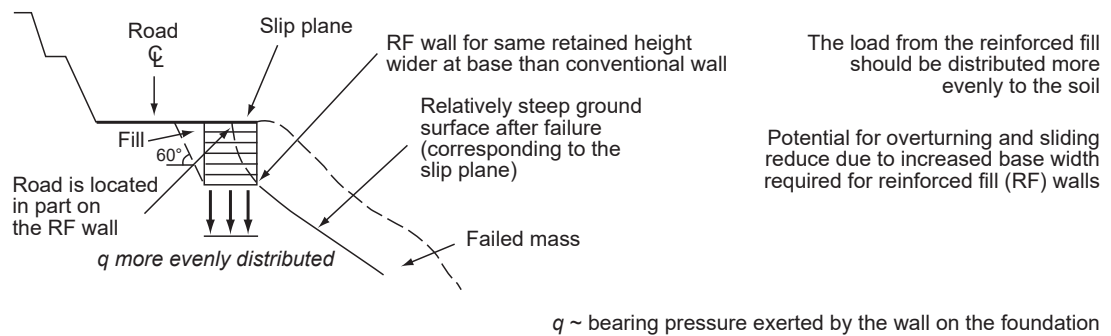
Distribution of bearing pressure on reinforced fill walls
